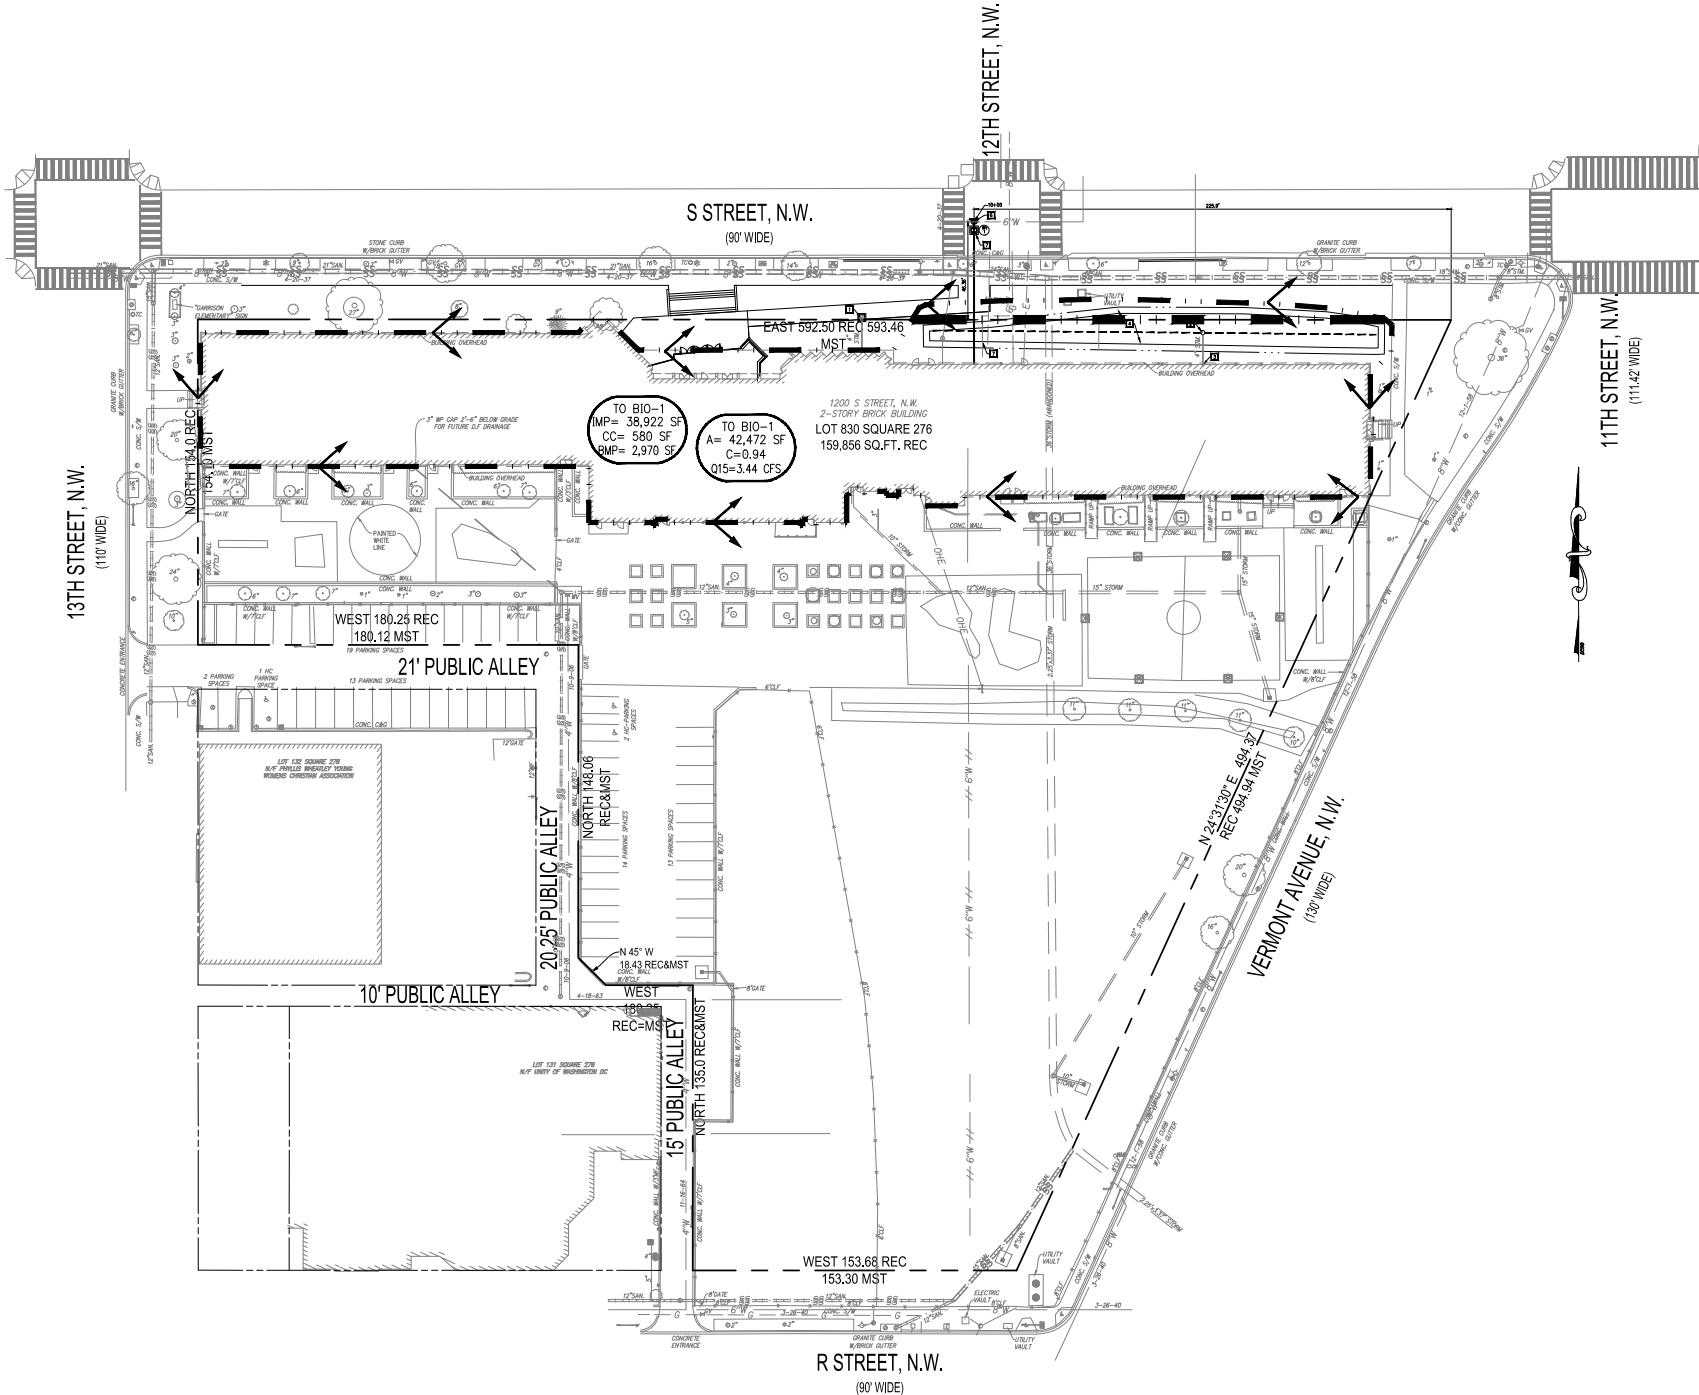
PRELIMINARY STORMWATER MANAGEMENT PLAN
